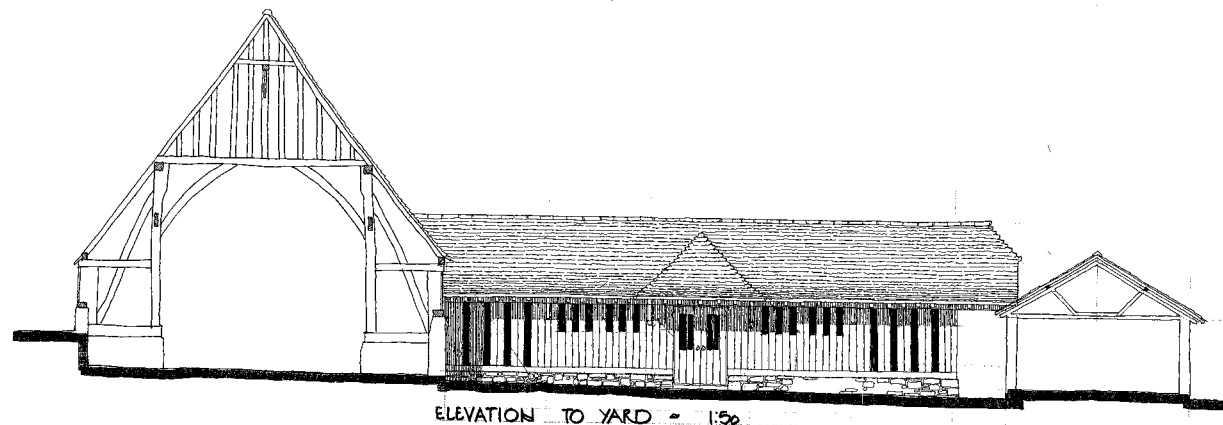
| Sketch elevations of new link to the barn on northern boundary
